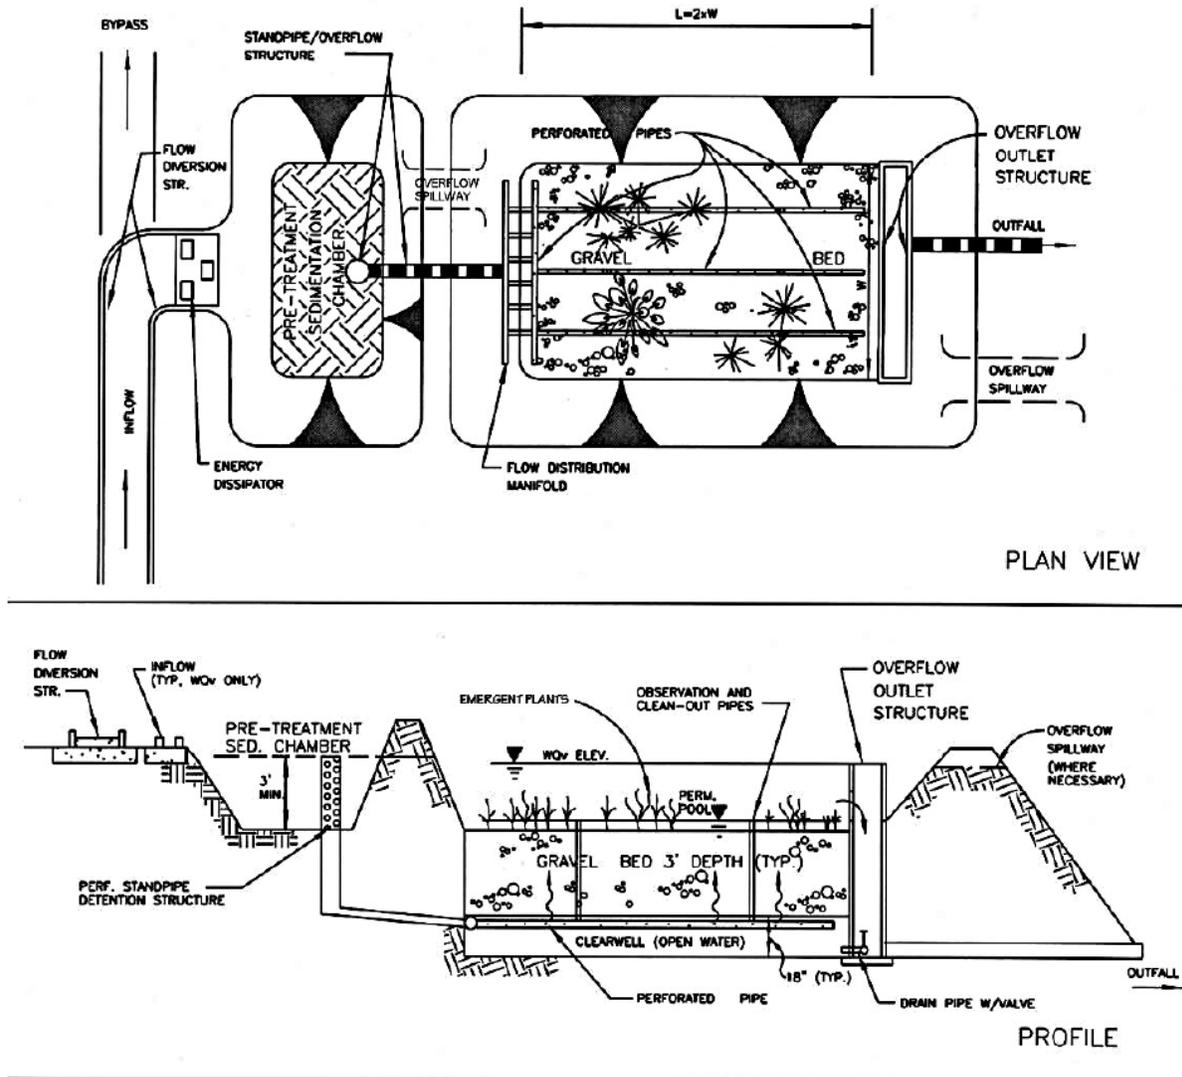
Plan View and Longitudinal Section for a Subsurface Gravel Wetland Design
